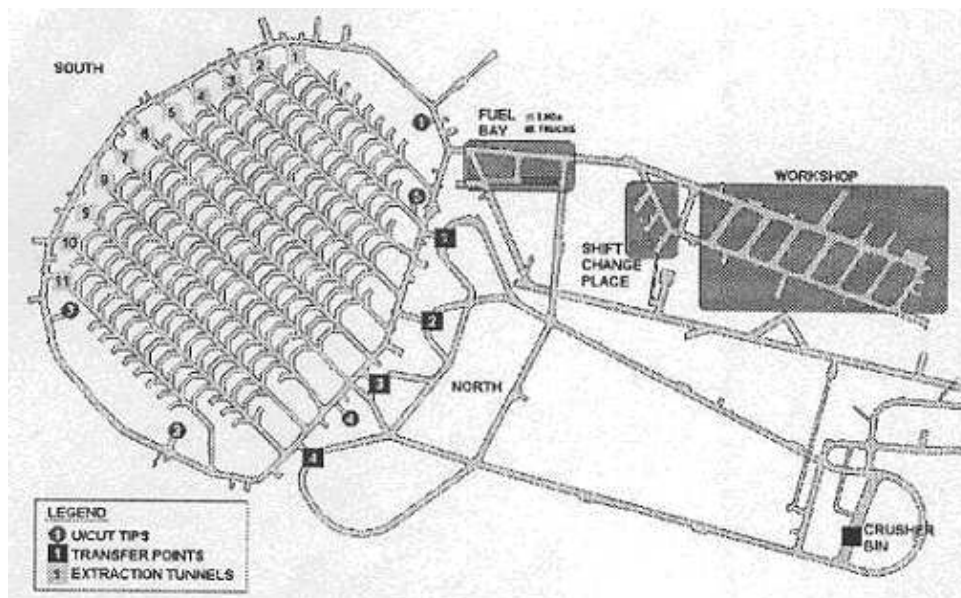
Layout of a typical trackless underground block cave mine, [Figure Courtesy of De Beers Consolidated Mines]
